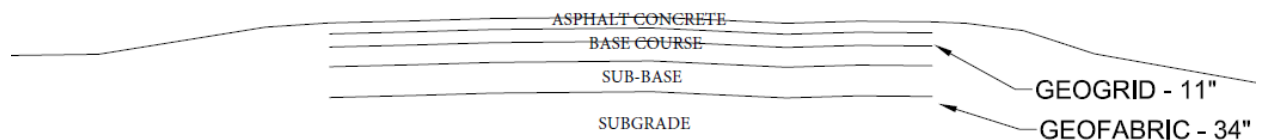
The as-built cross section of the test section FWD5-1. Horizontal scale is equal to vertical scale.
